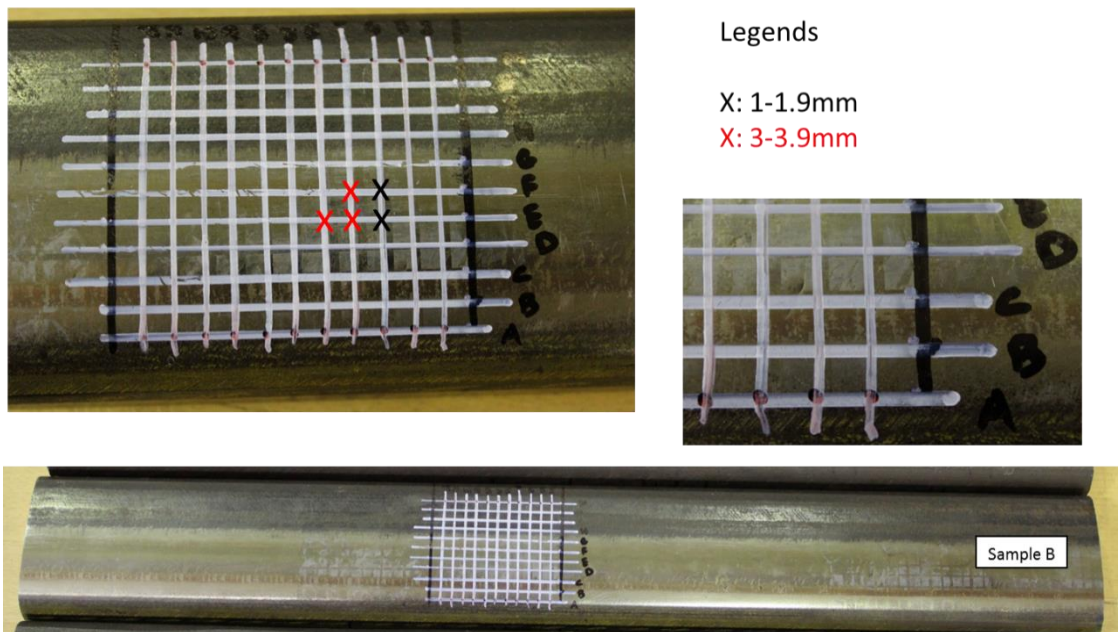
Sample B - Baby squat defect with medium internal defect size. 'X' marked the location of the internal defect.
